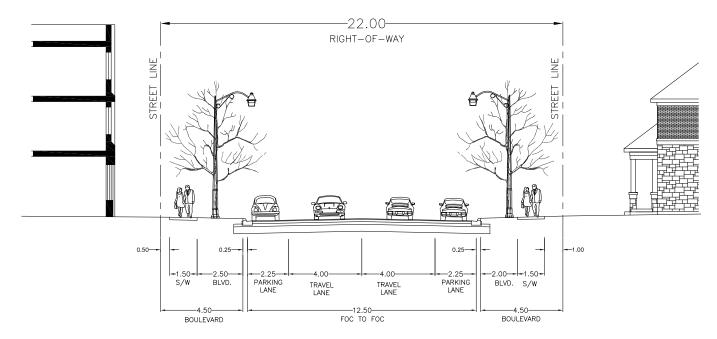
d- Avenue / Transit Corridor - 22.0m R.O.W. / 2 travel lanes / on-street parking on both sides / 4.5m boulevard
